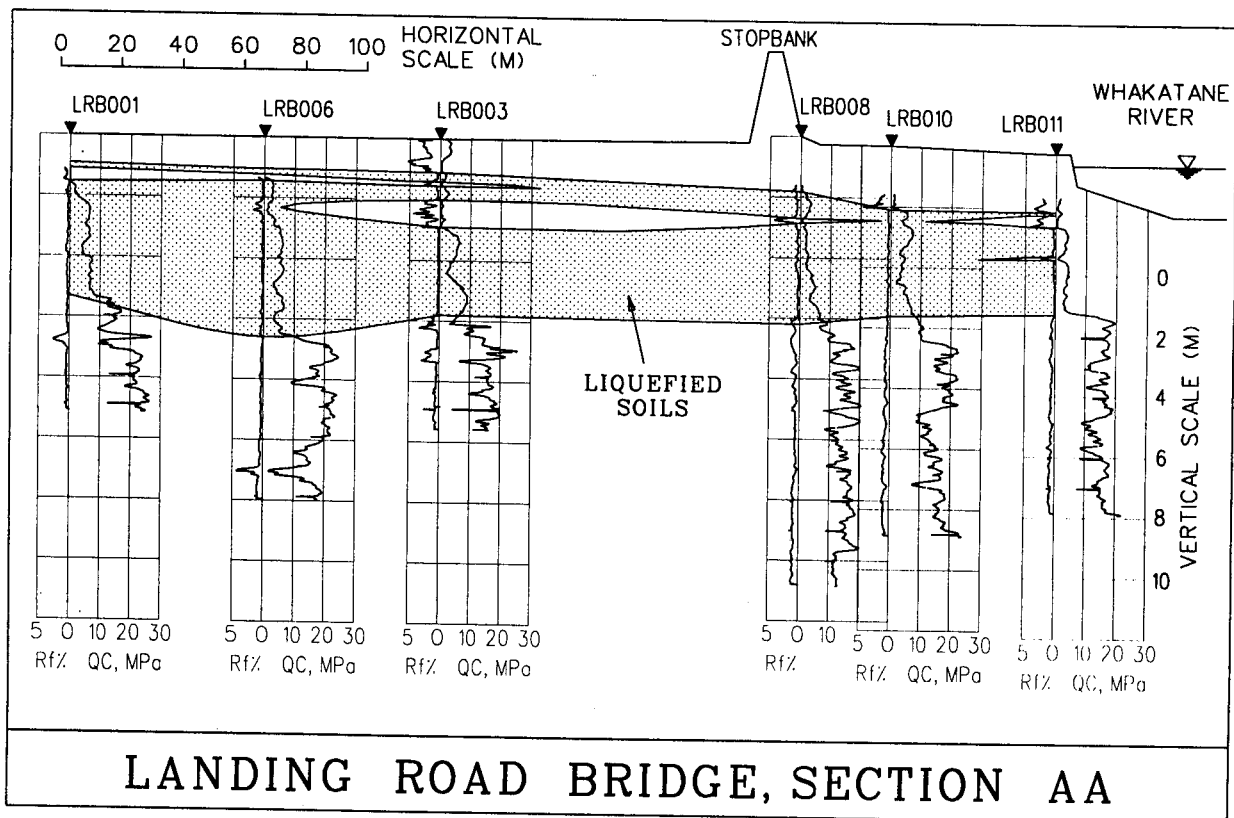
Section AA at Landing Road Bridge site showing CPT data and estimated liquefied soils.
